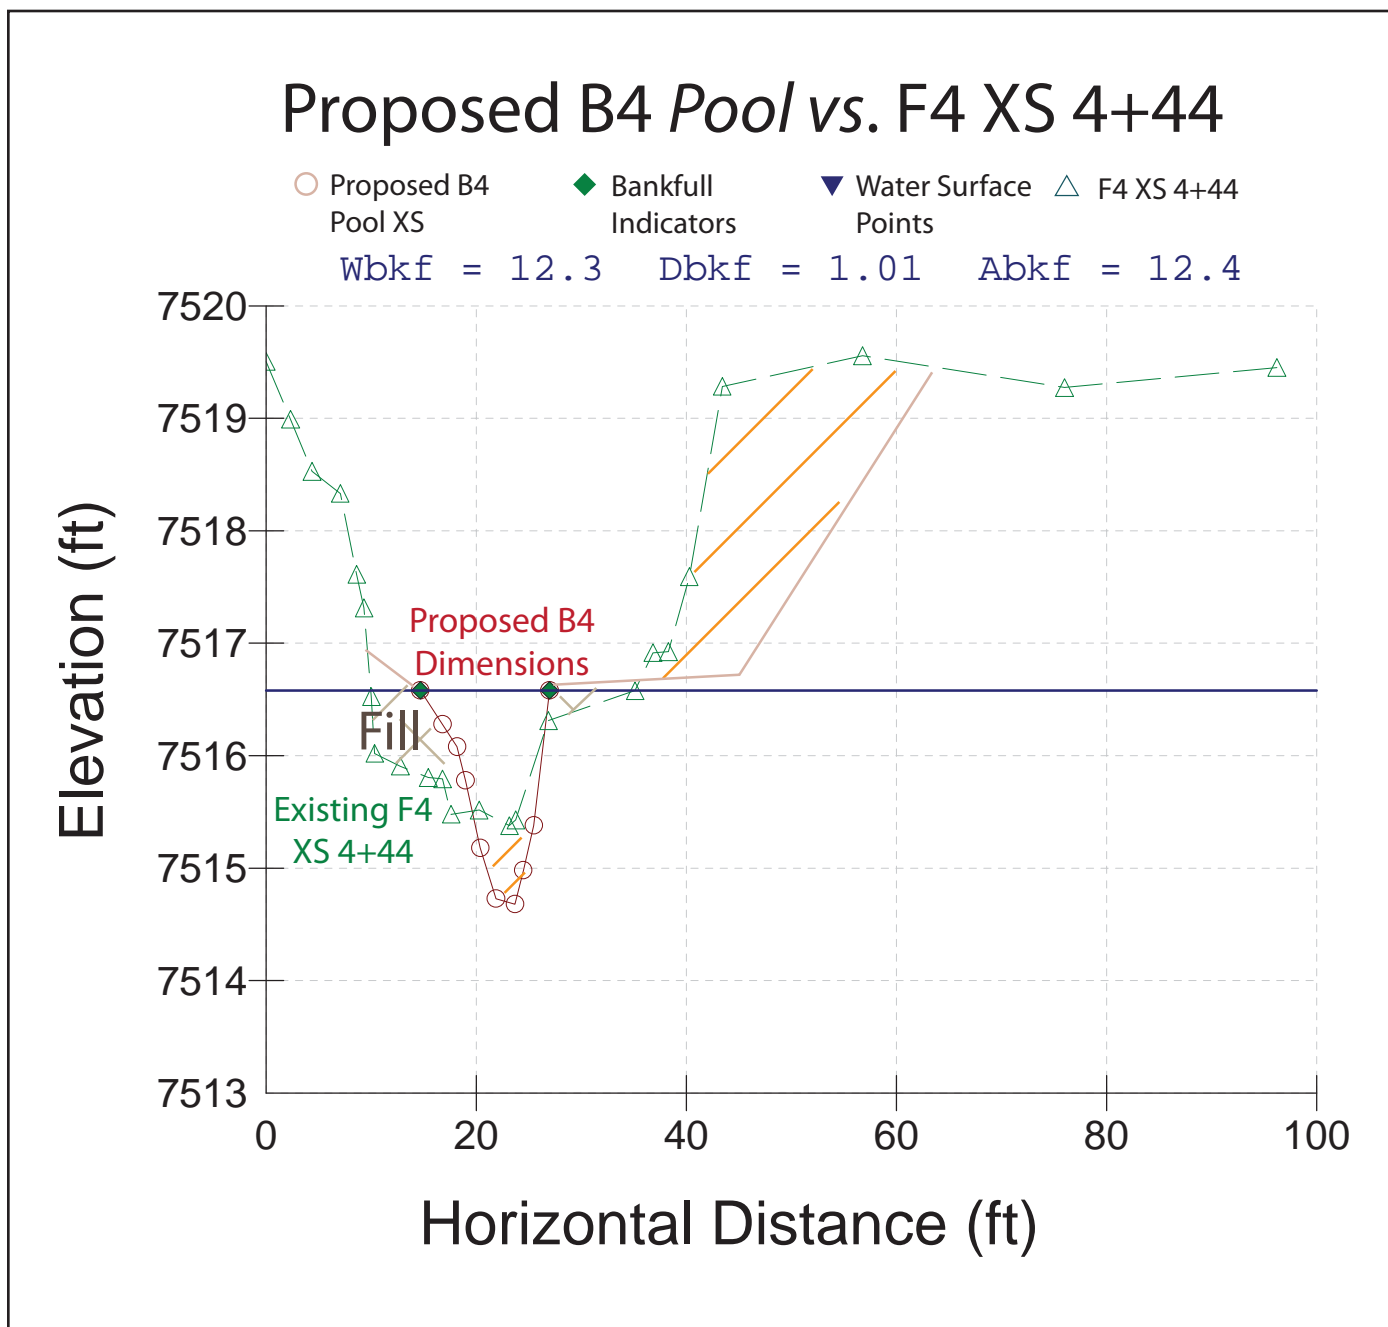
The proposed B4 *pool* cross-section compared to the existing F4 cross-section 4+44, indicating the cut and fill requirements.
